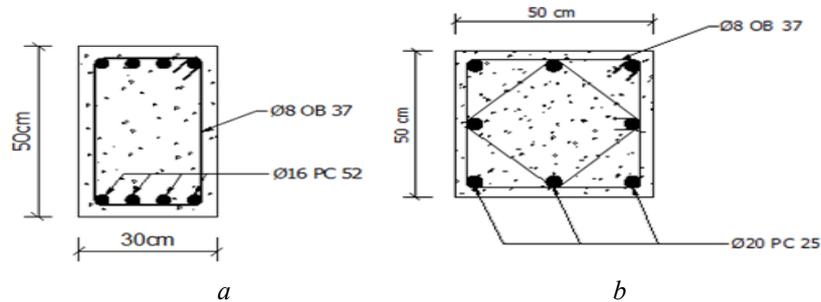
Considered cross-sections: *a* – beams; *b* – columns.
